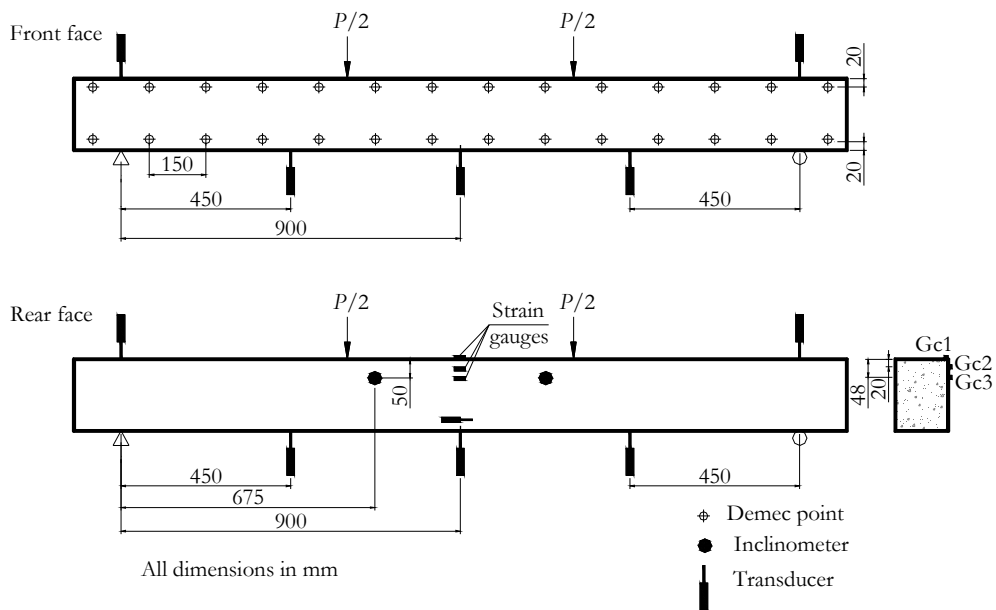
Instrumentation details for beam C1-216-D1-B.
